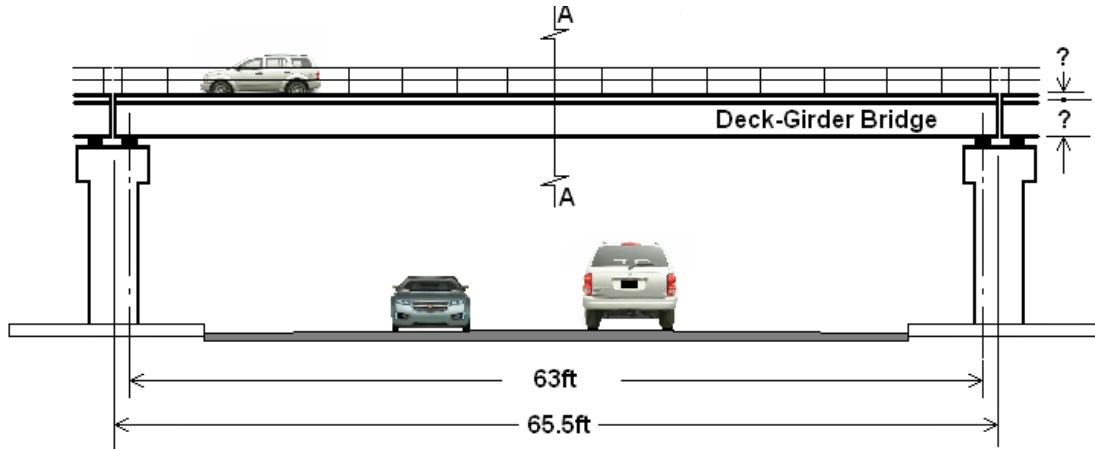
Longitudinal section of a Deck-Girder Bridge
